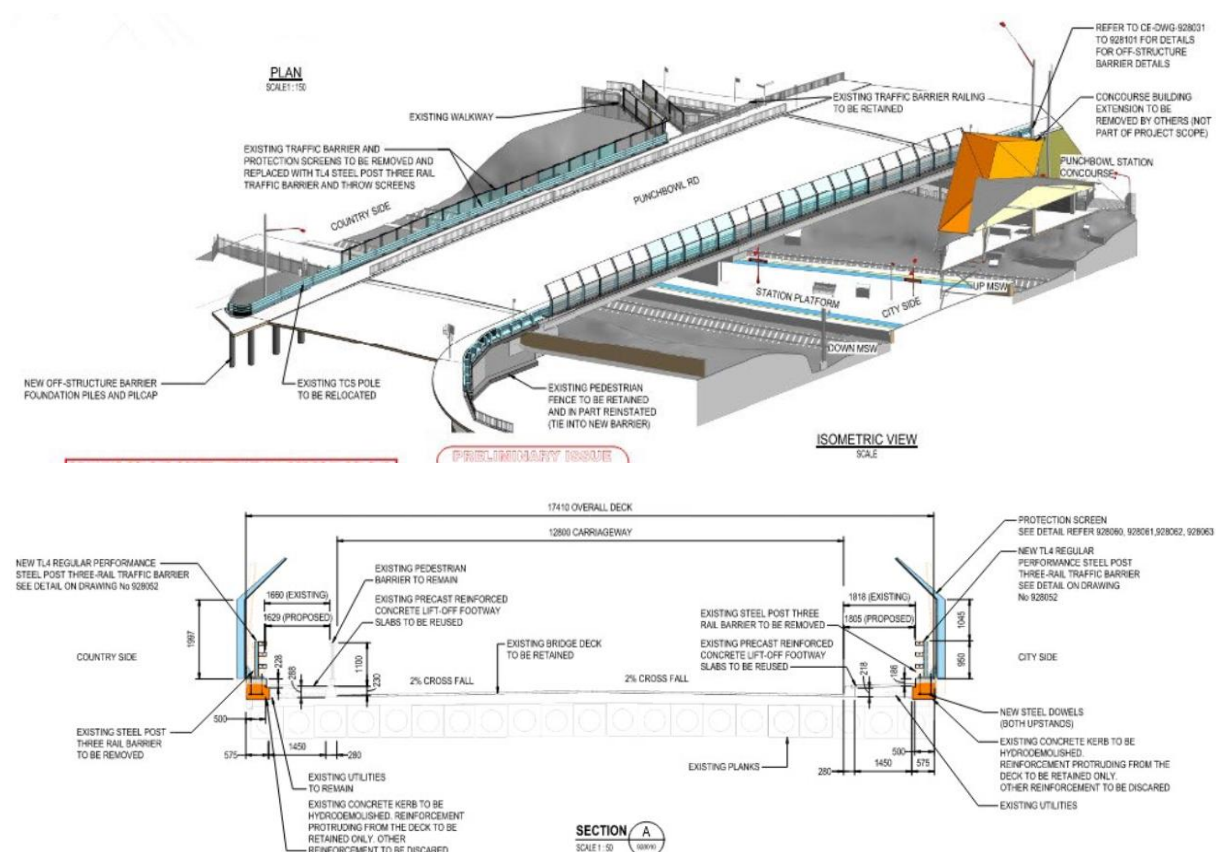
Plan of treatment works for Punchbowl Road Bridge (Source: [Metron T2M 2022 Aurecon 2024](#), provided by ARCH Artifex)
